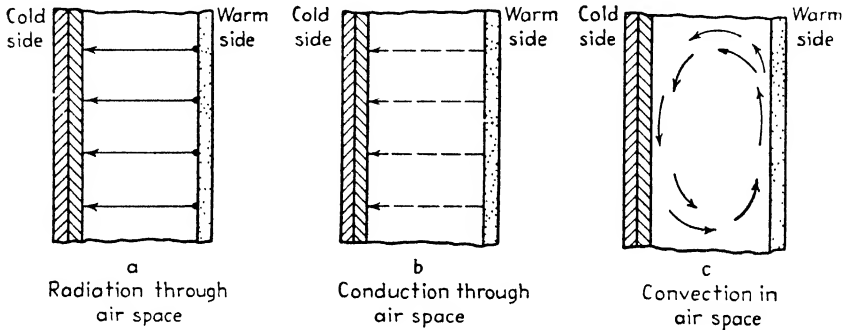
Heat transfer through air spaces in a hollow wall.
